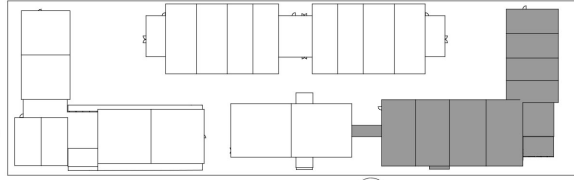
Building C: One-Bedroom Residence-Third Floor Plan | Scale: 1:200.
